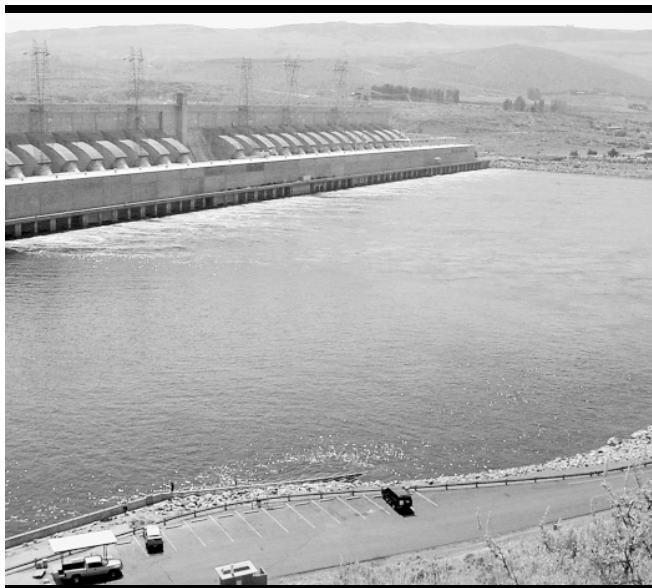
Photo Looking Down at Current Parking Facility at Chief Joseph Dam
